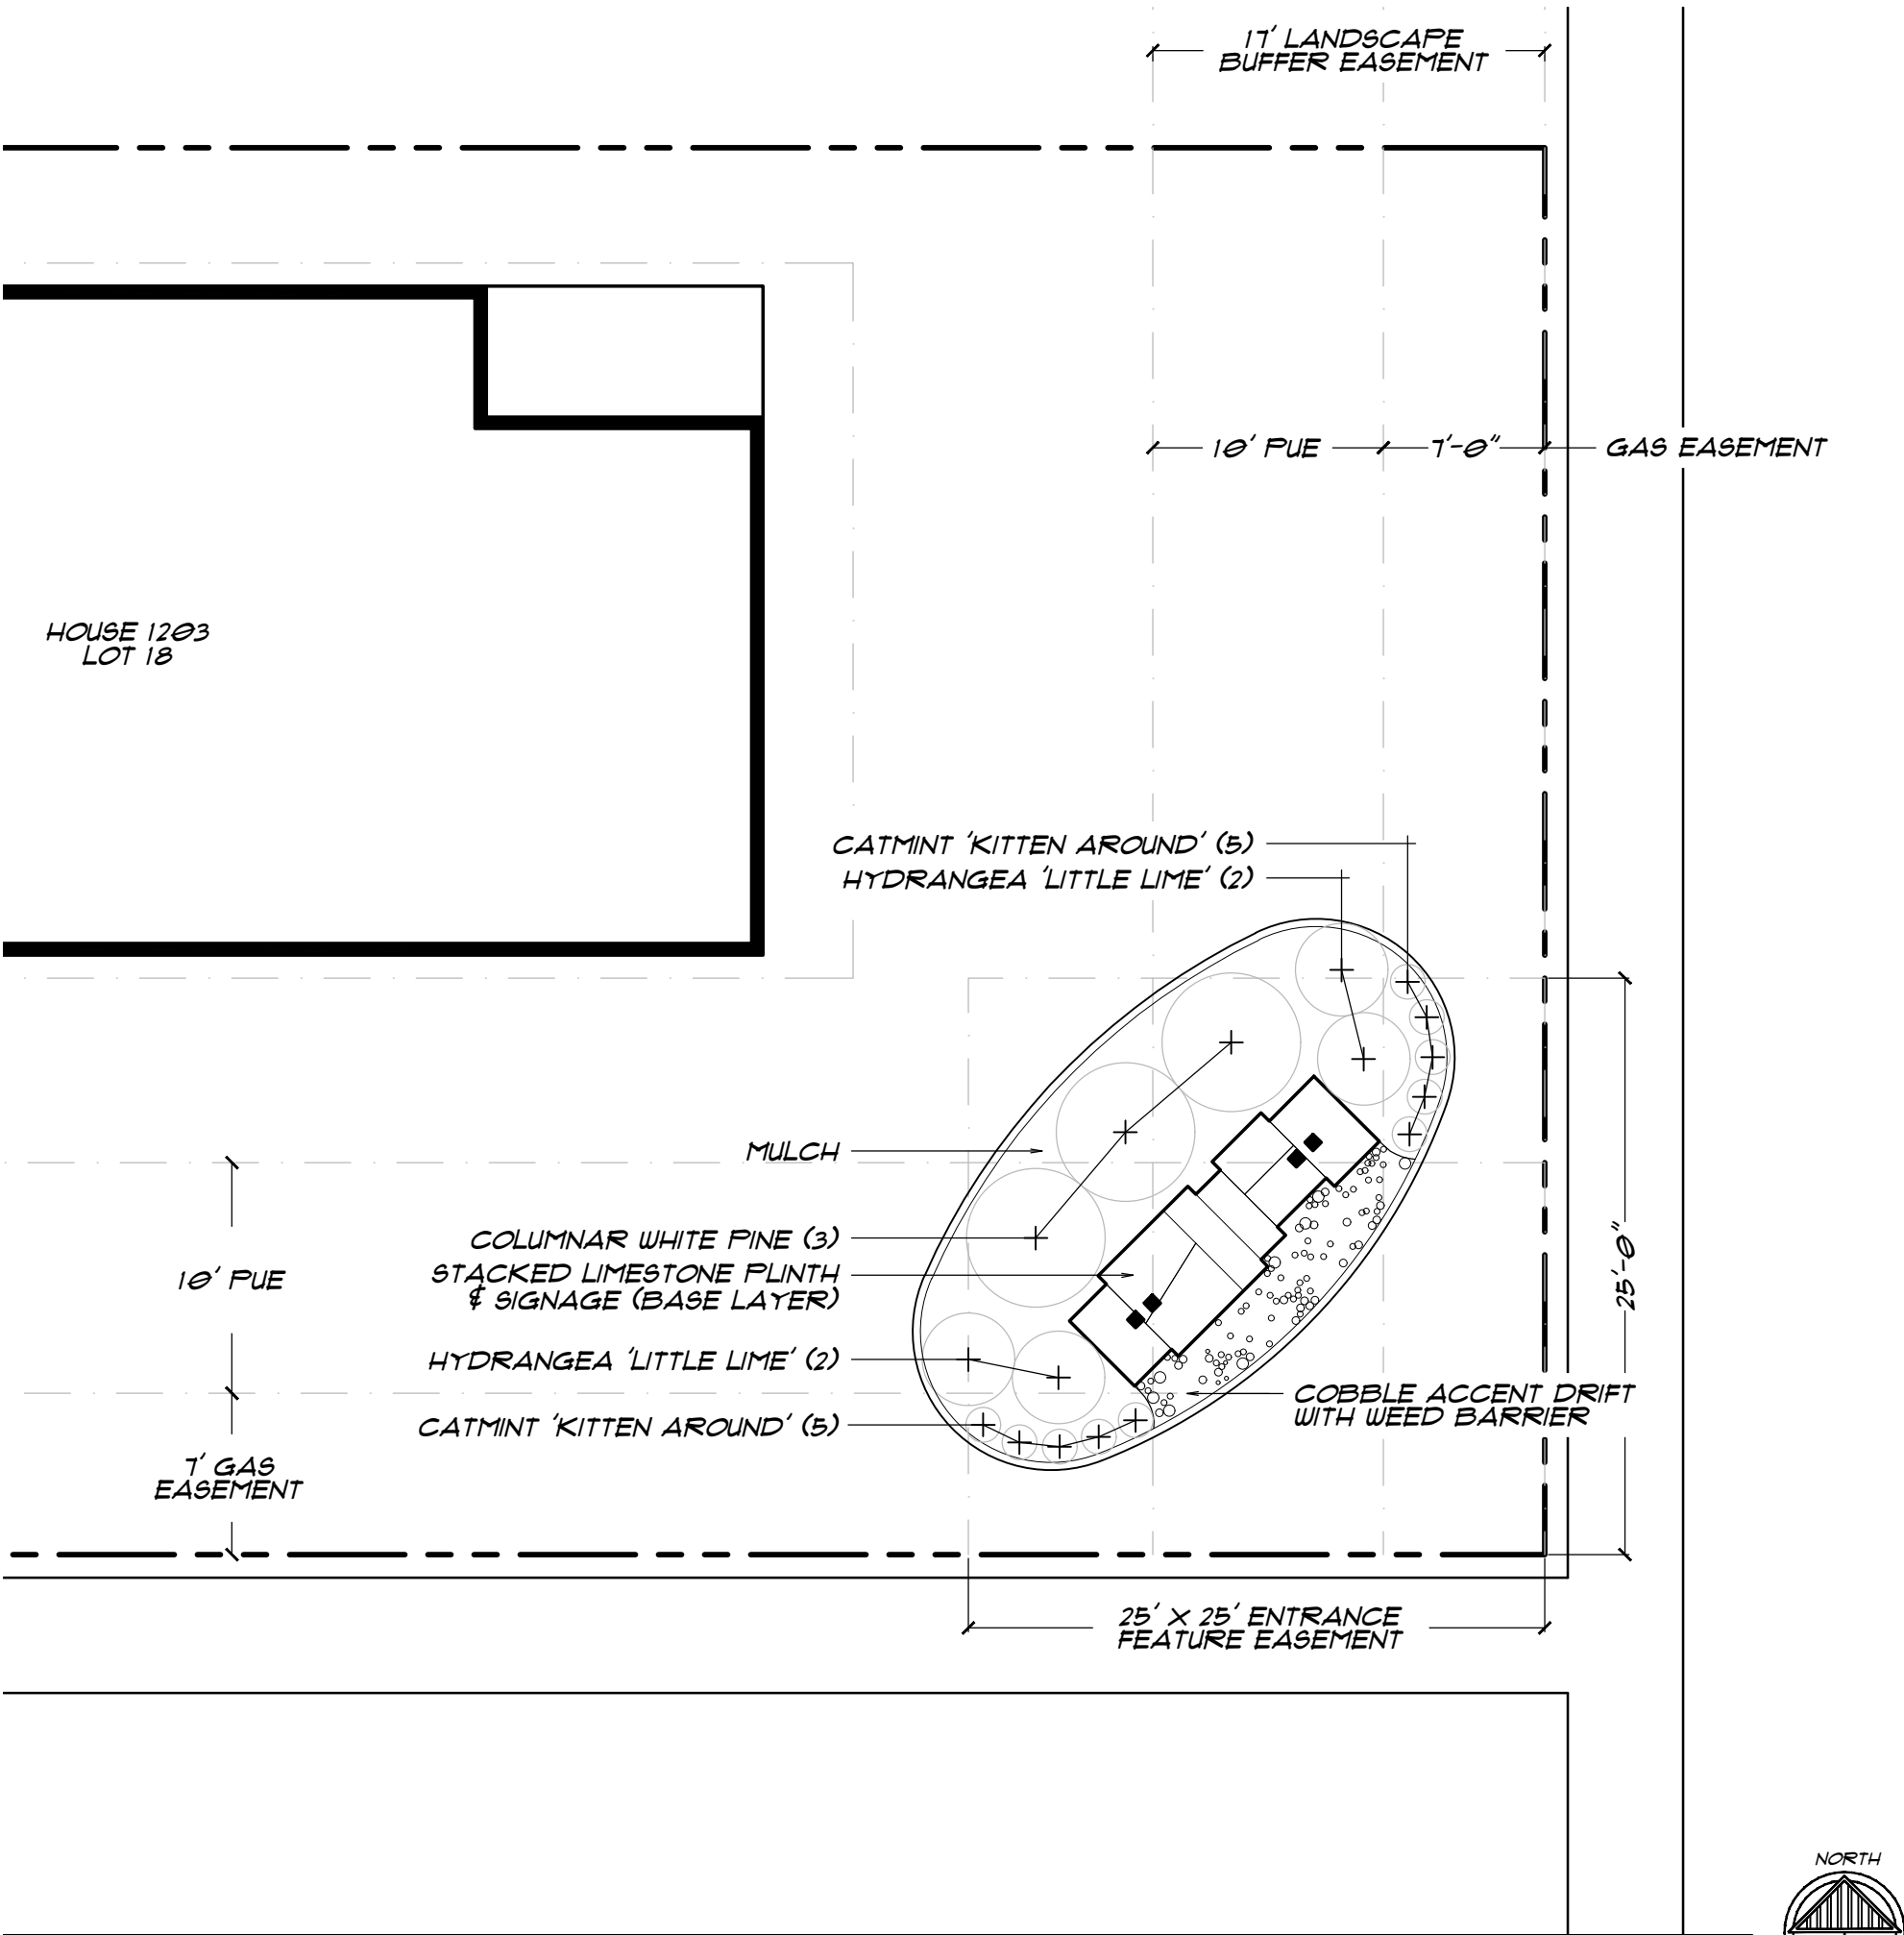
DETAIL PLAN - 1/8" = 1'-0"
